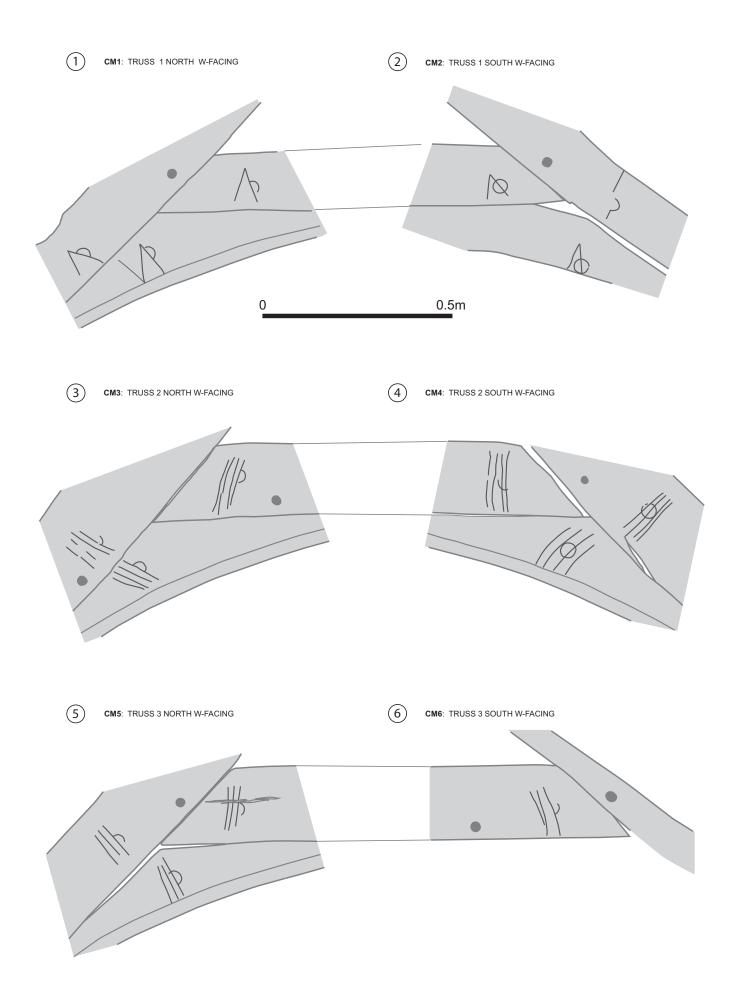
Carpenters Marks (CMn) on the chapel roof trusses (scale 1:10 @A4).
